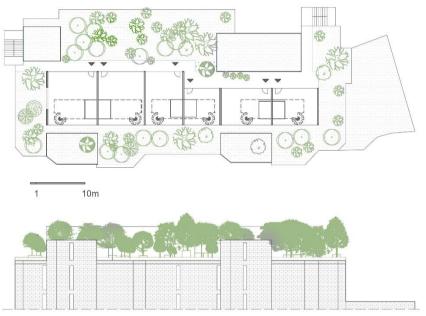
Plan and elevation of rooftop extension. Source: authors.
